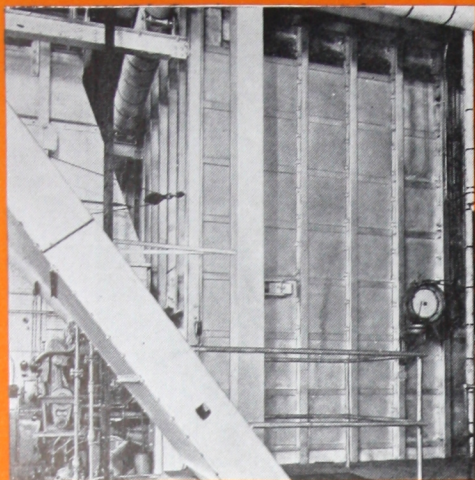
Walls, Ducts, Casings, Drums of Large Boilers Insulated With INSULAG.
